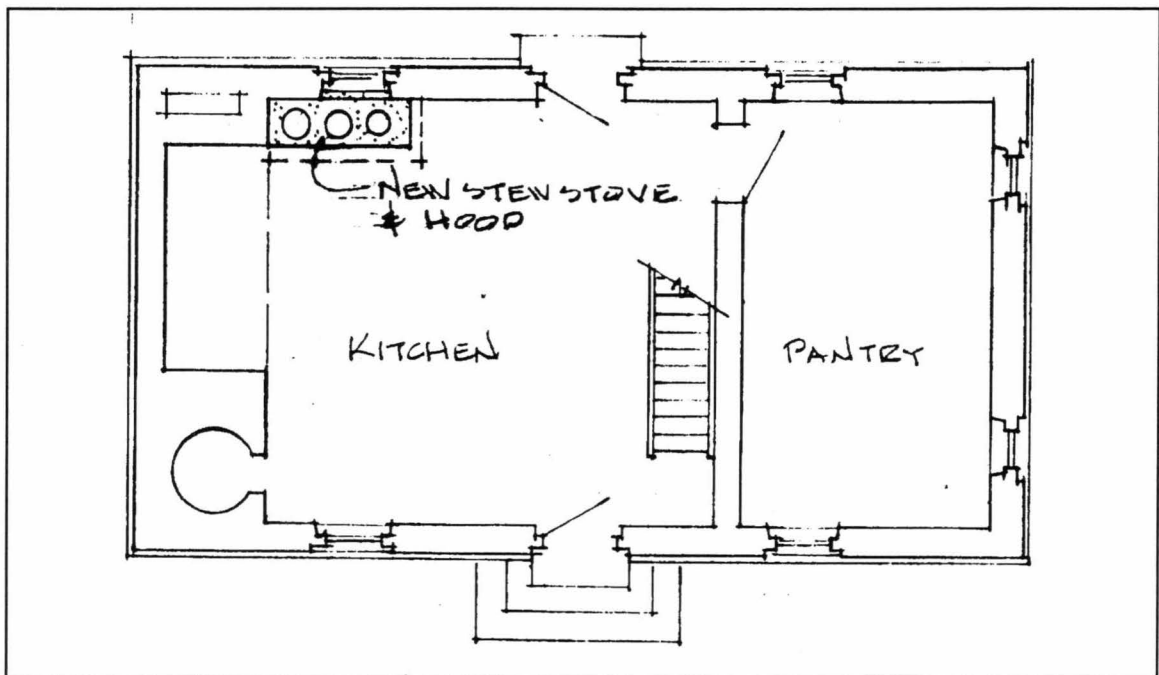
Plan of Palace kitchen showing new stew stove (drawing by James Waite, Colonial Williamsburg Foundation).
